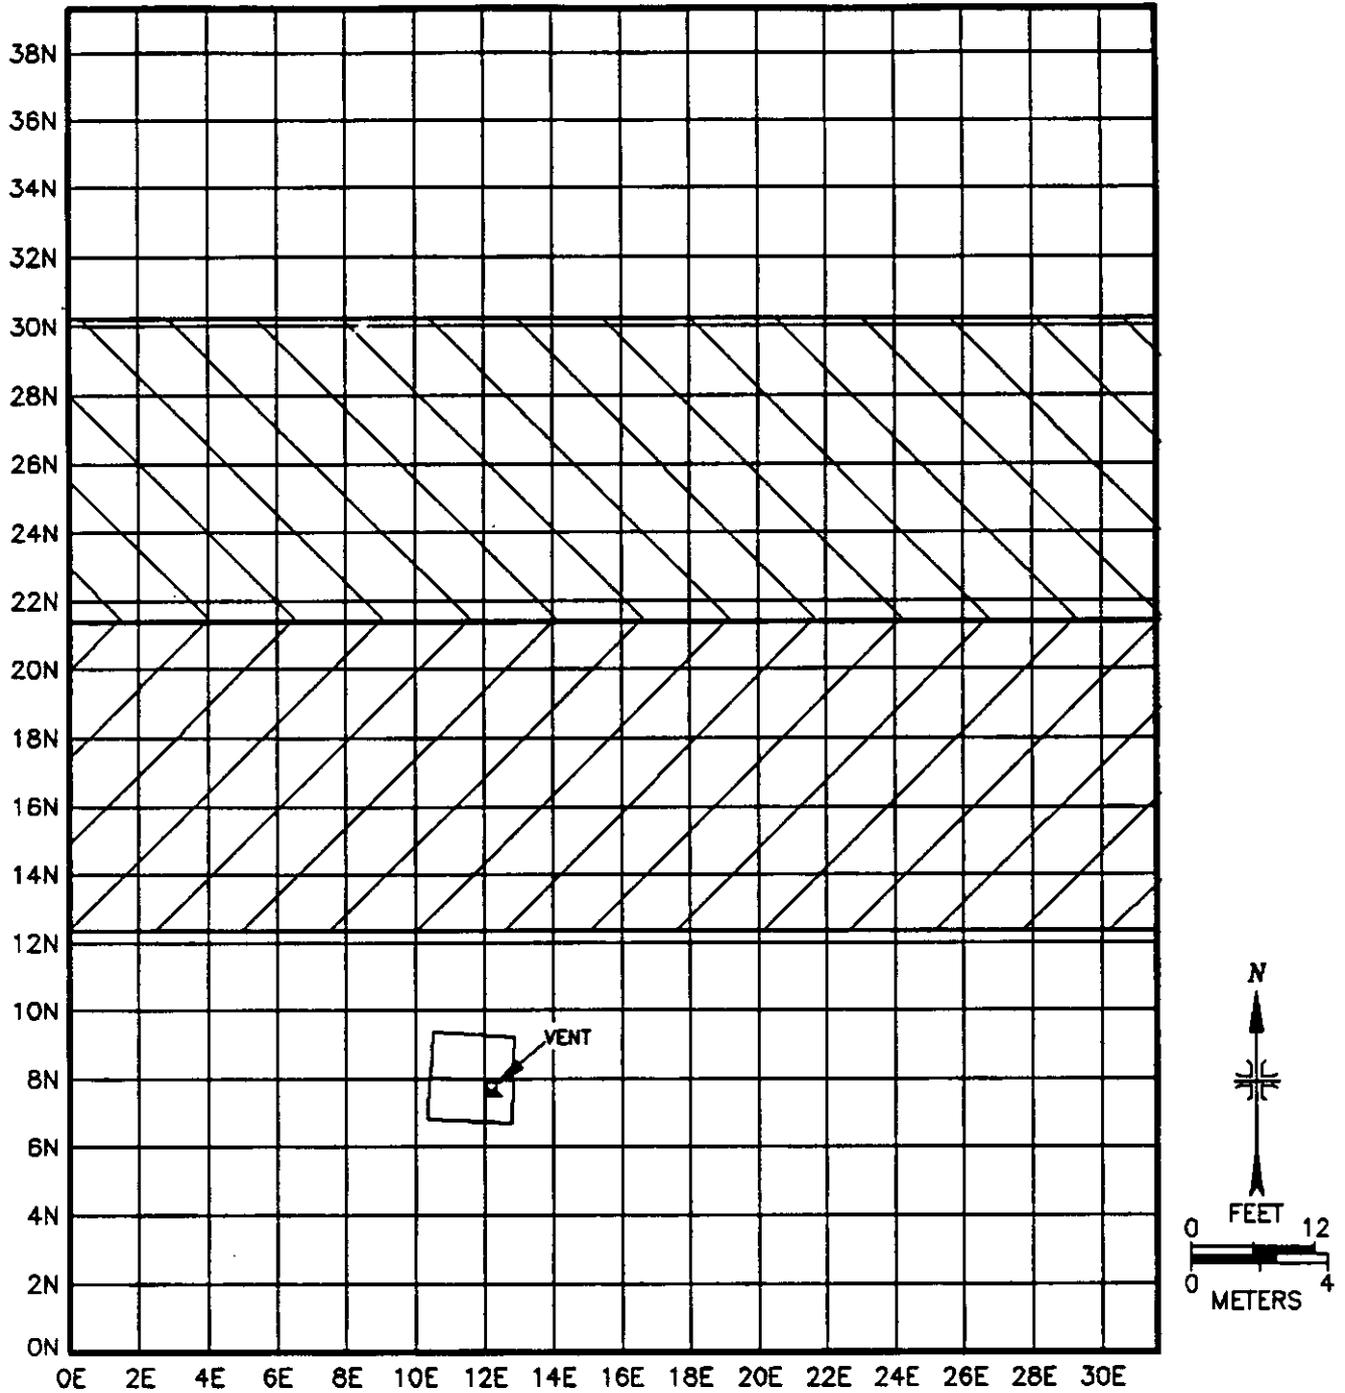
ARC Building 23 Roof Showing Location of Vent Above Upper Storage Area
